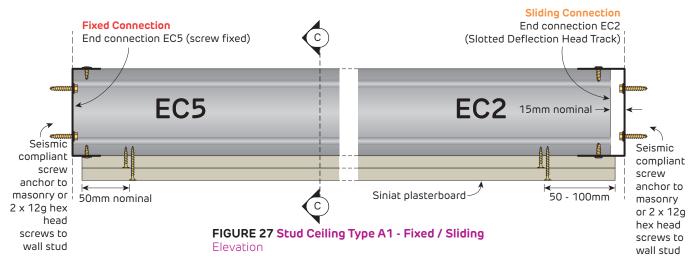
Stud Ceiling Type A1 - Fixed / Sliding
